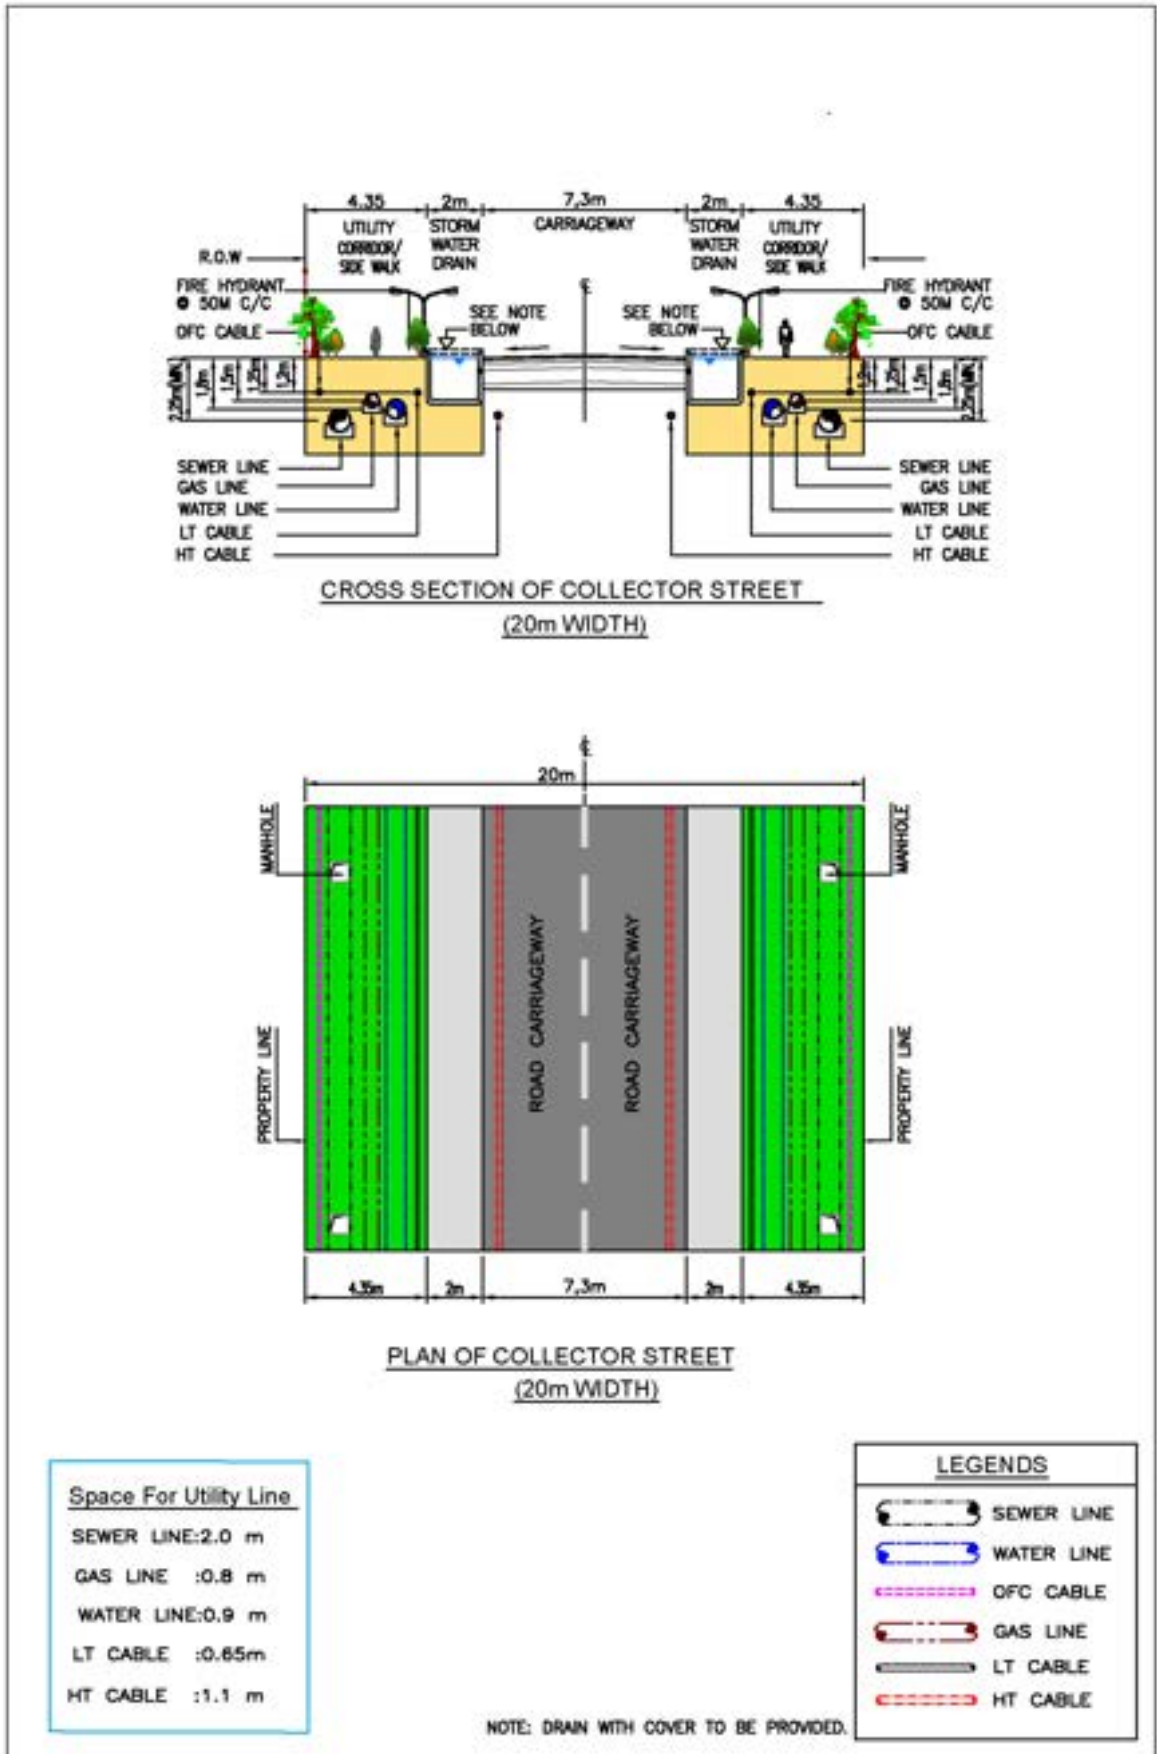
Cross section and Plan of 20m ROW Collector Street
